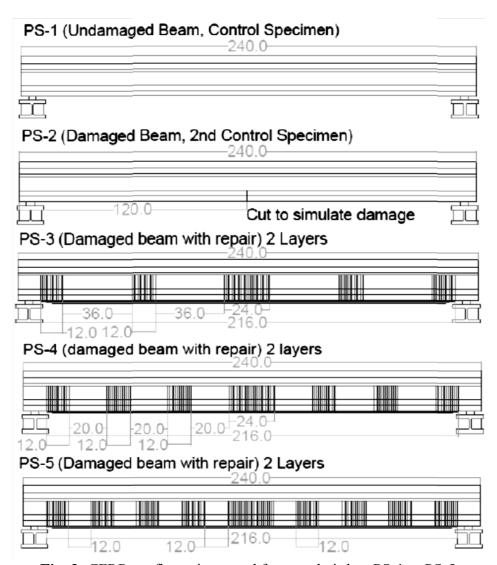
CFRP configurations used for tested girders PS-1 to PS-5
